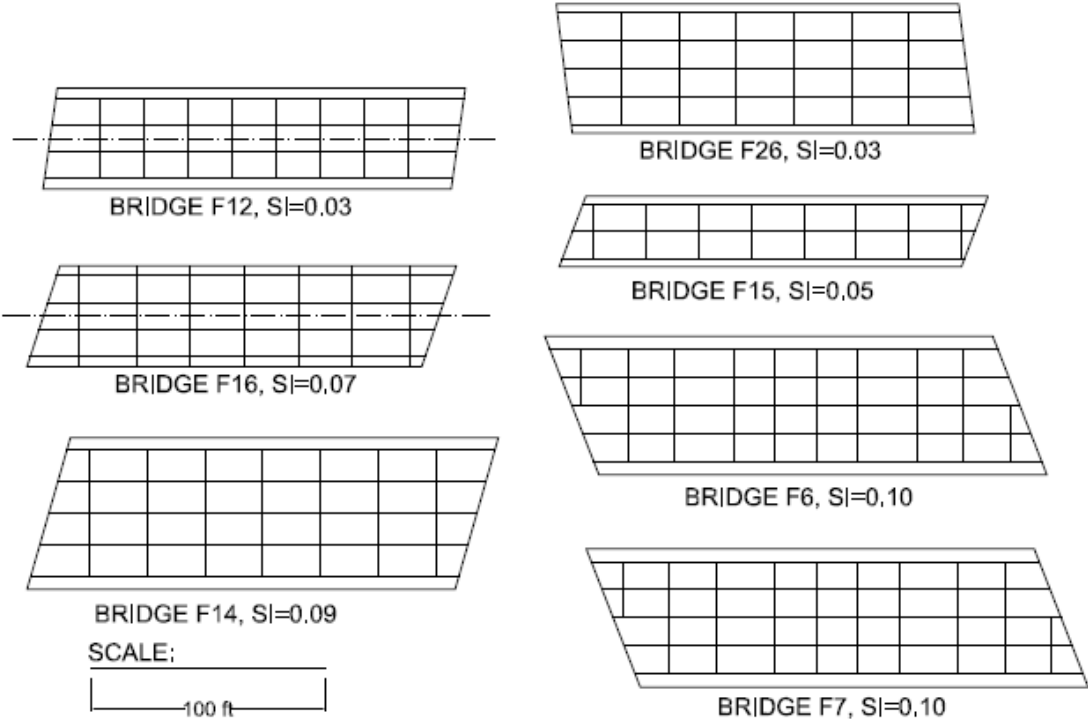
Other simple-span bridges with contiguous cross-frame arrangement.
